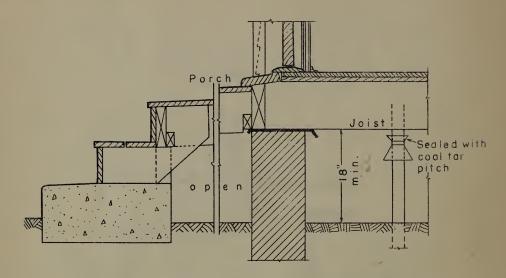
SIDE OF PORCH STEPS OPEN, MODIFIED BREAD-PAN SHIELD OVER WALL
